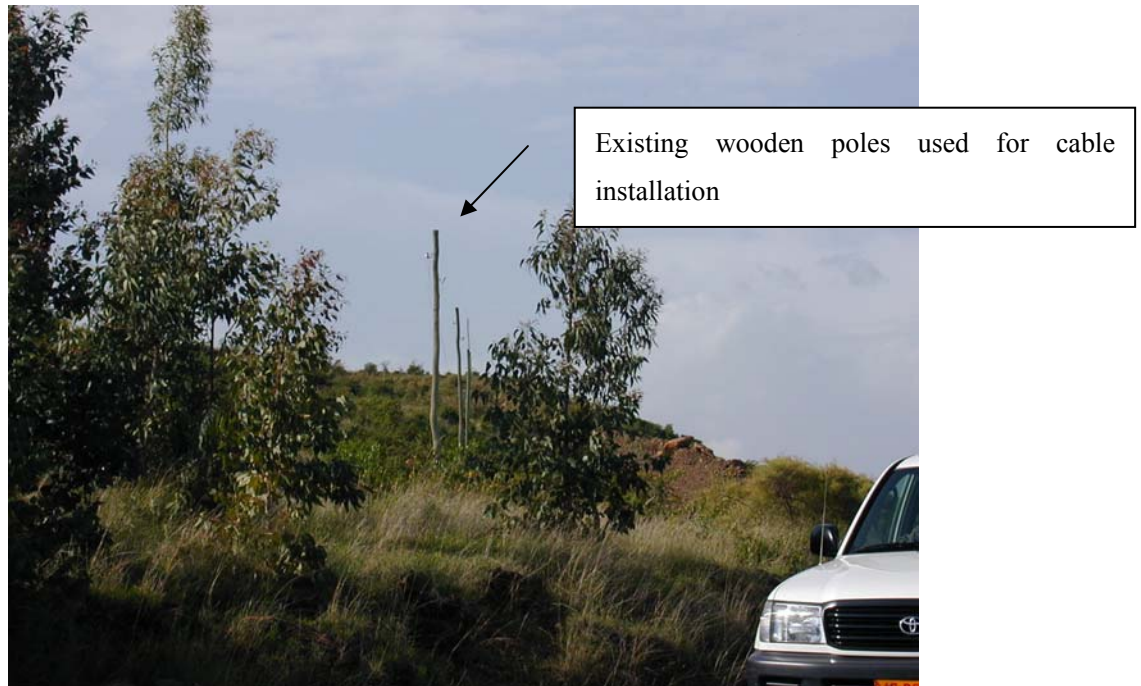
Available Aerial Cable Route to Adam West Rep. Station
